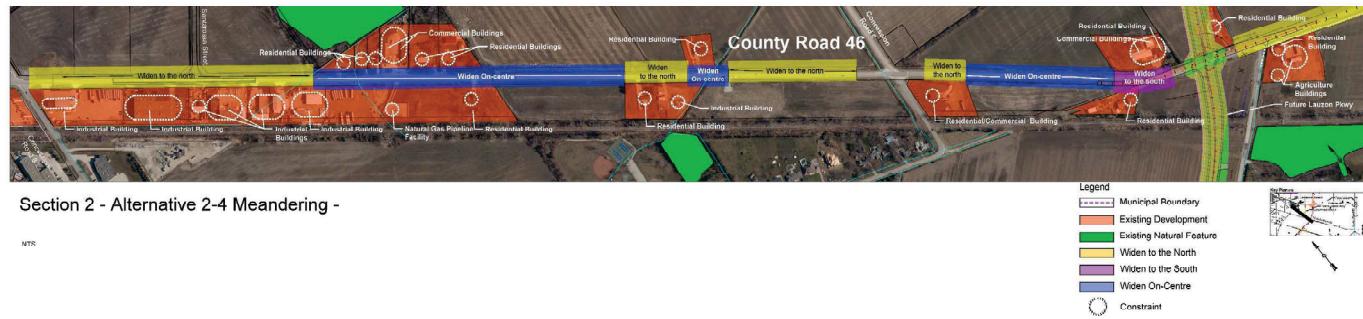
County Road 46 Section 2 Alignment Alternative 2-4
